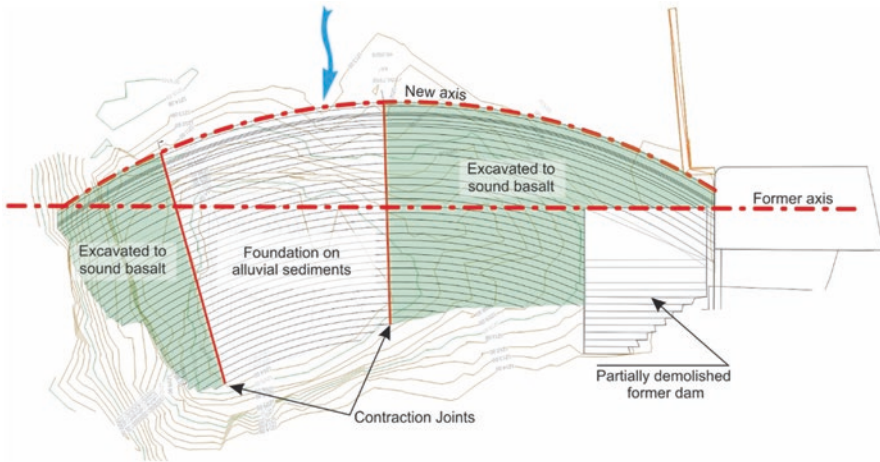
Plan view of the new lay out of the dam, showing former and new axis development
